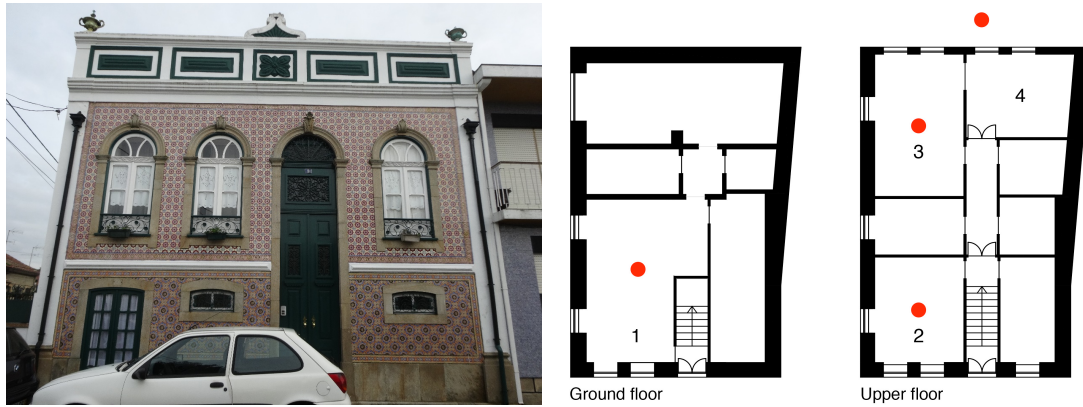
(left) External view; (right) Floor plans showing the position of measuring instruments (1—living room; 2—bedroom; 3—dining room; 4—kitchen).
